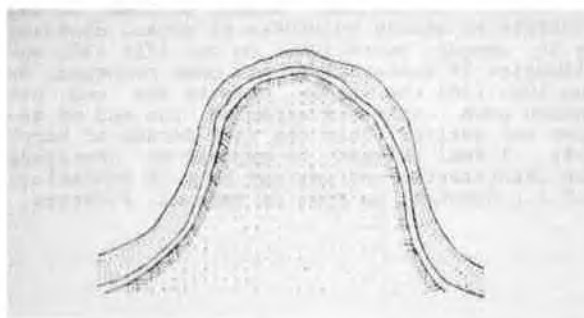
Reinforcing of existing embankments by spreading over them geotextiles and covering them with original ground.
